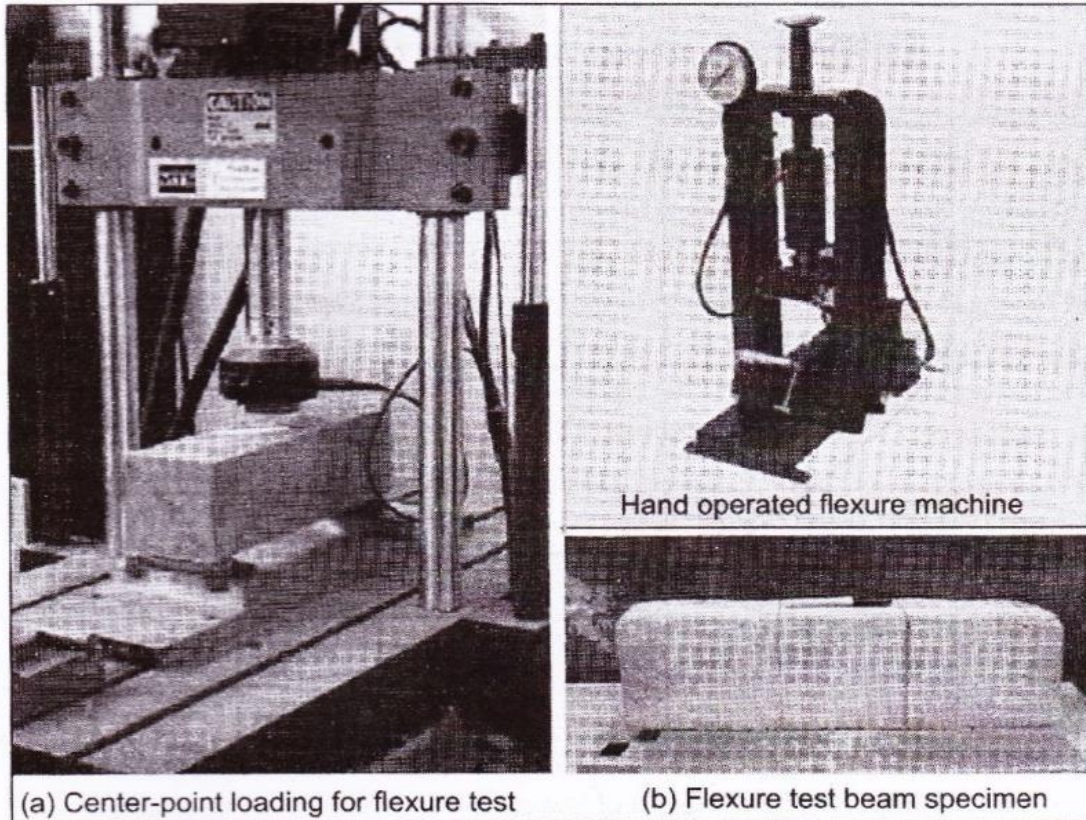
Flexural Testing machine (FTM), test setup and specimen
